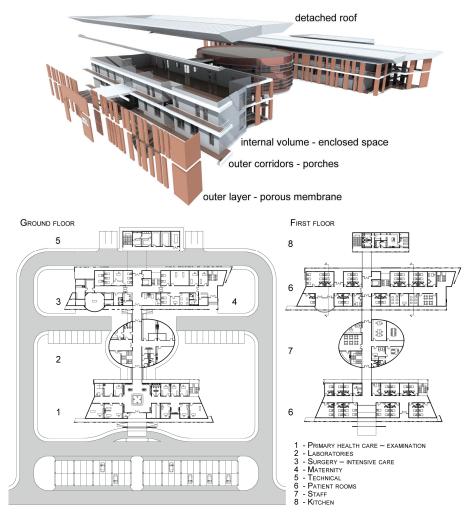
"Exploded perspective" of the Hospital building (top) and floor plans (bottom)
